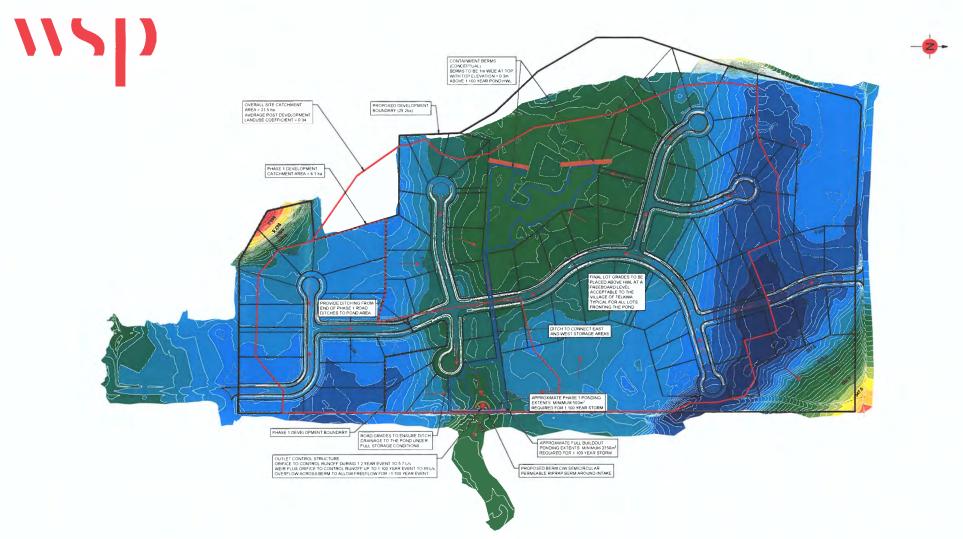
BLISSFUL GROVE PROPOSED DEVELOPMENT PLAN FUTURE CATCHMENT AREAS AND STORMWATER MANAGEMENT AREAS
